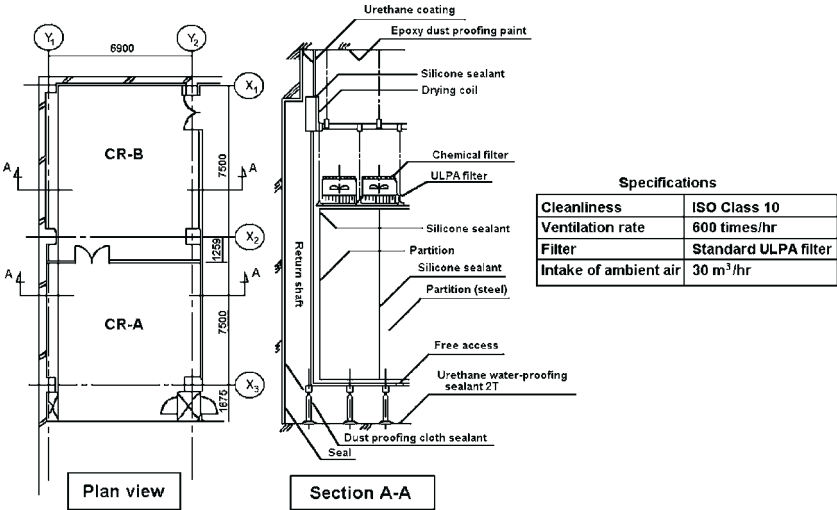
Example of the plan view and a section A-A of a typical cleanroom.
